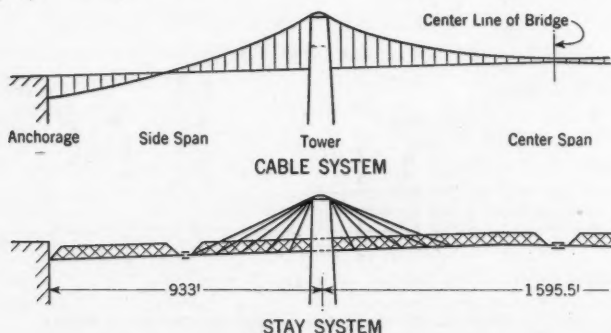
CABLE AND STAY SYSTEMS, BROOKLYN BRIDGE
